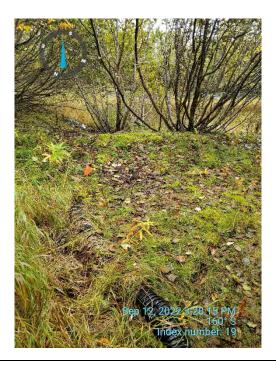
View south. Black corrugated drain pipe protruding from southeast exclusion fence towards southern holding pond. Pipe terminates just before holding pond (orange flagging).
